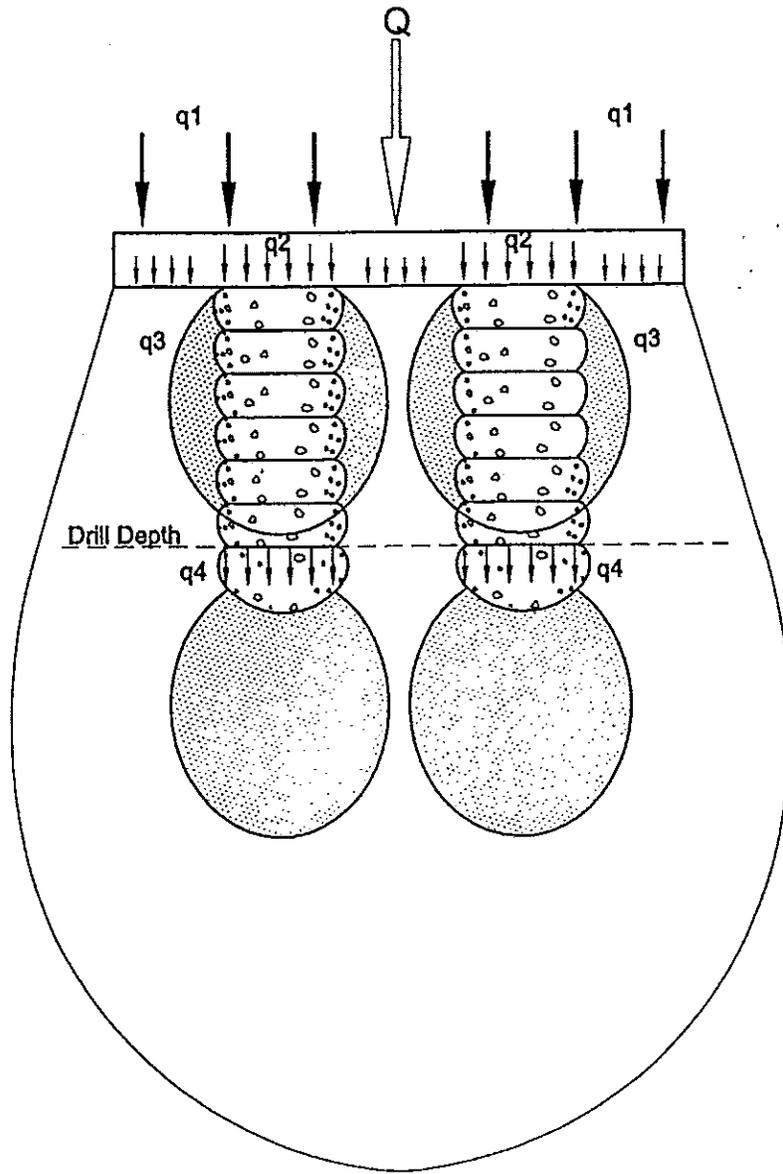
Schematic Diagram of Pressure Isobars Below a Footing Supported by Geopier Elements
